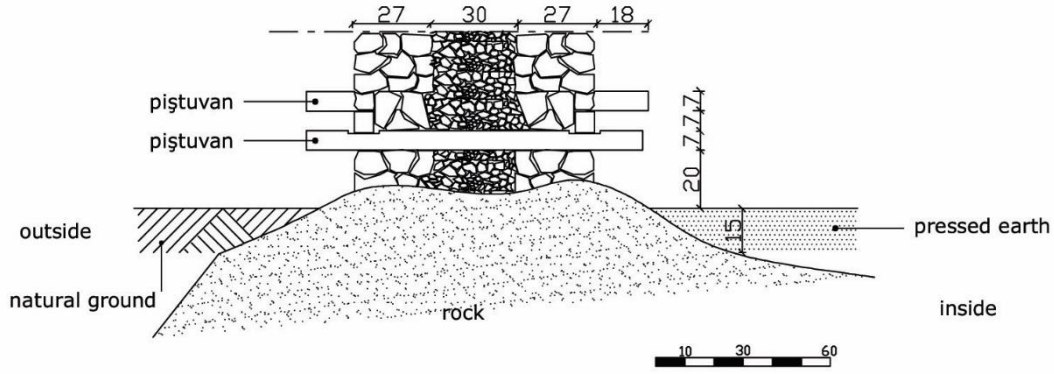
Drawing of the Foundation Type A (Çelik 2009)
